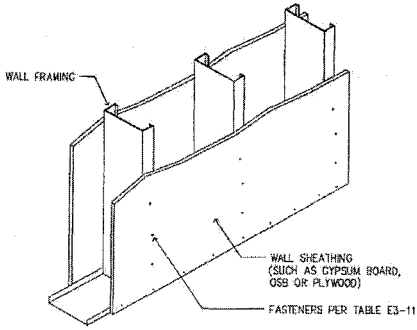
Stud Bracing with Sheathing Material Only (AISI 2002d)
